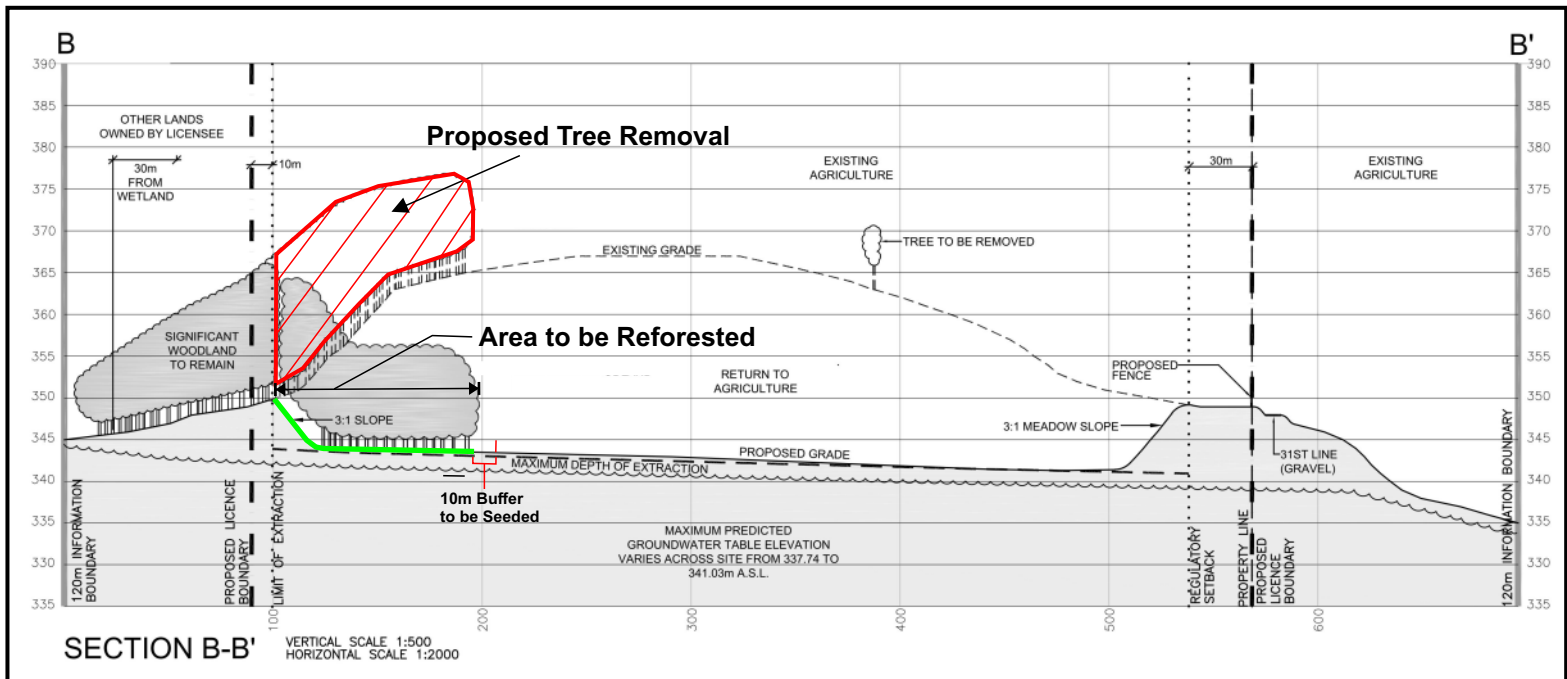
Cross Section of Existing Woodland to be Removed, and the 3:1 Slope and Pit Floor to be Reforested
